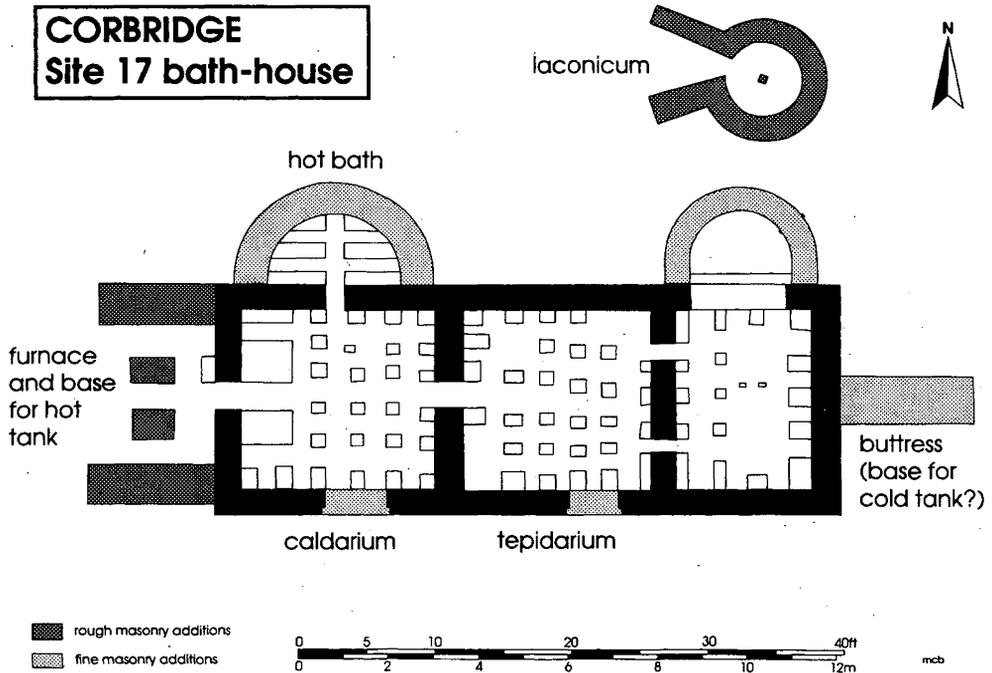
Plan of the Site 17 bath-house at Corbridge, based on Forster & Knowles 1910, Fig. 8.
